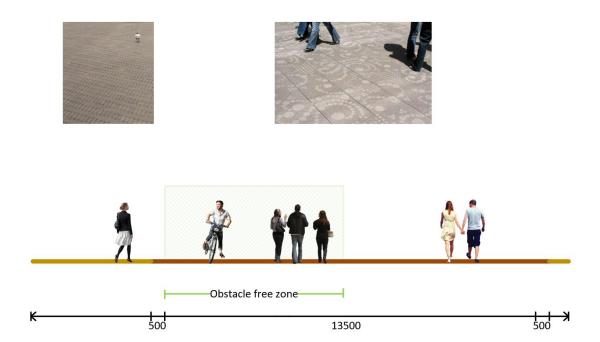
Cross-section alternative 3; photo's: (Dienst Stedelijke Ontwikkeling, 2021)
